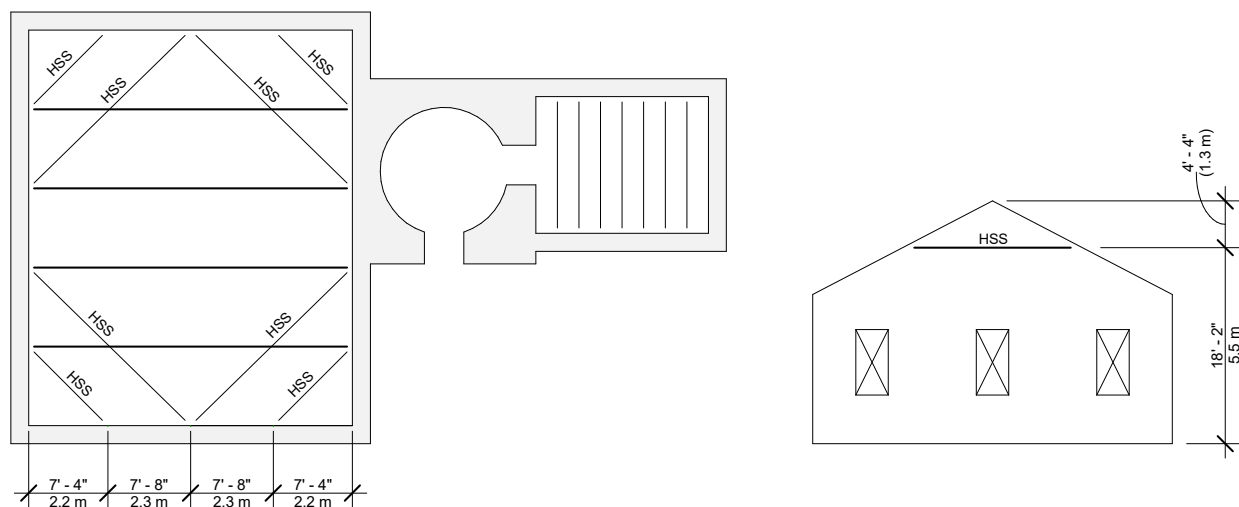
Diamond Braces Retrofit Scheme Plan and Elevation
